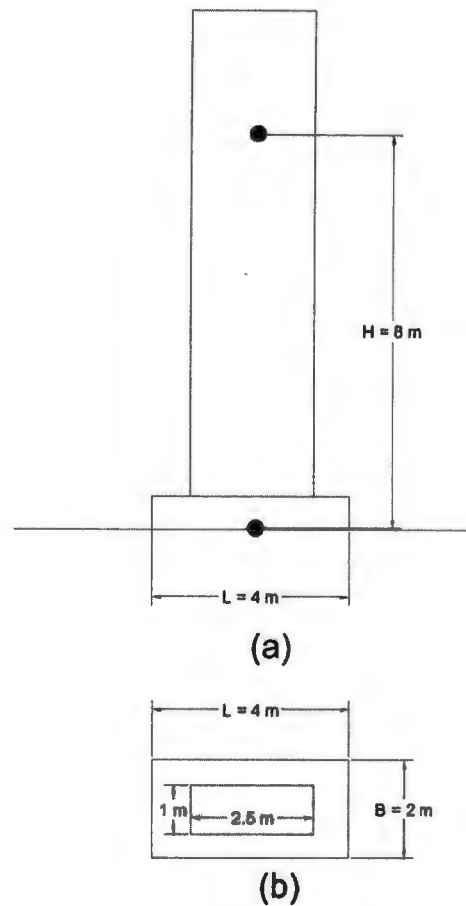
Shear wall-footing system with dimensions (a) elevation view and (b) plan view
